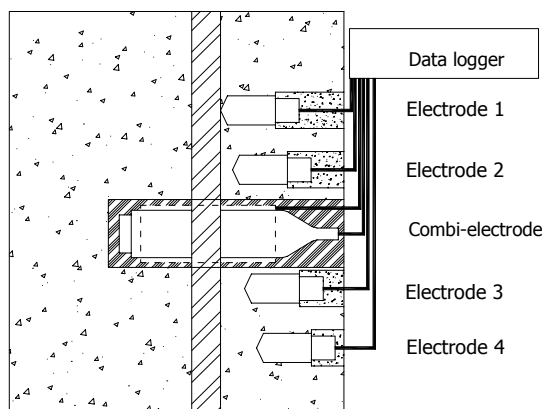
Sectional view of the mounted CorroRisk probe
